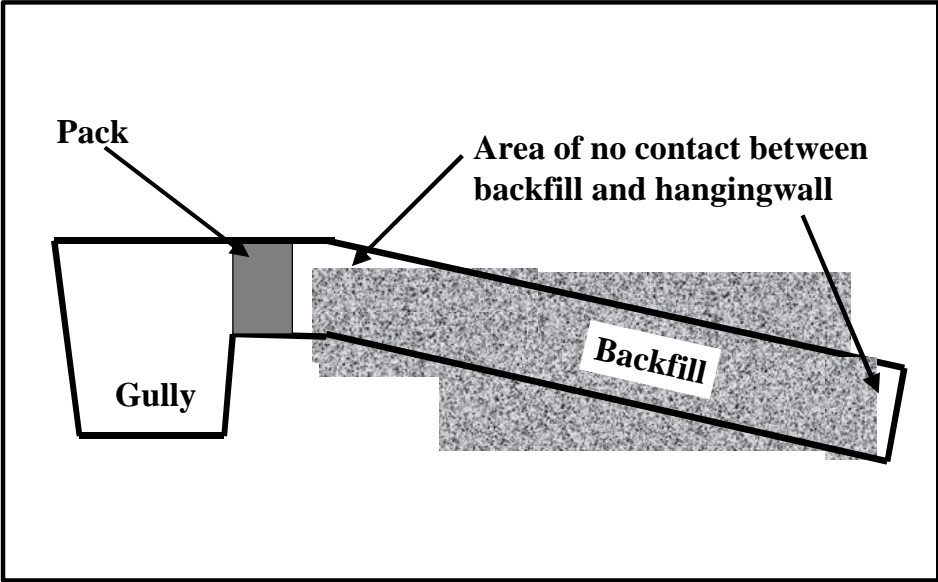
Section view of stope showing the lack of contact at up-dip and down-dip sides of panel between the backfill and the hangingwall.
